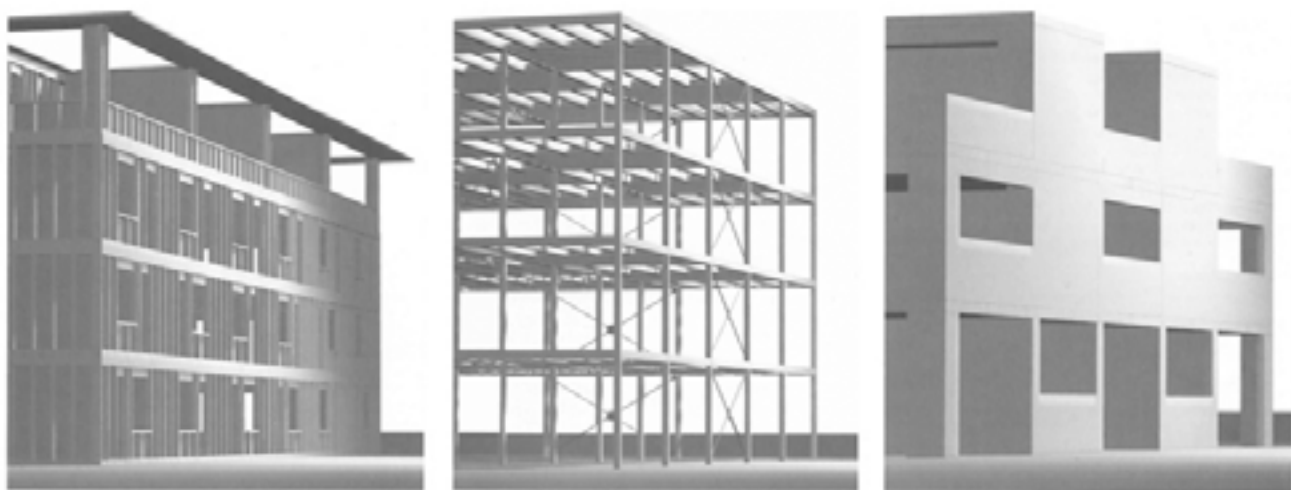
WOOD-BASE BUILDING CONSTRUCTION SYSTEMS
